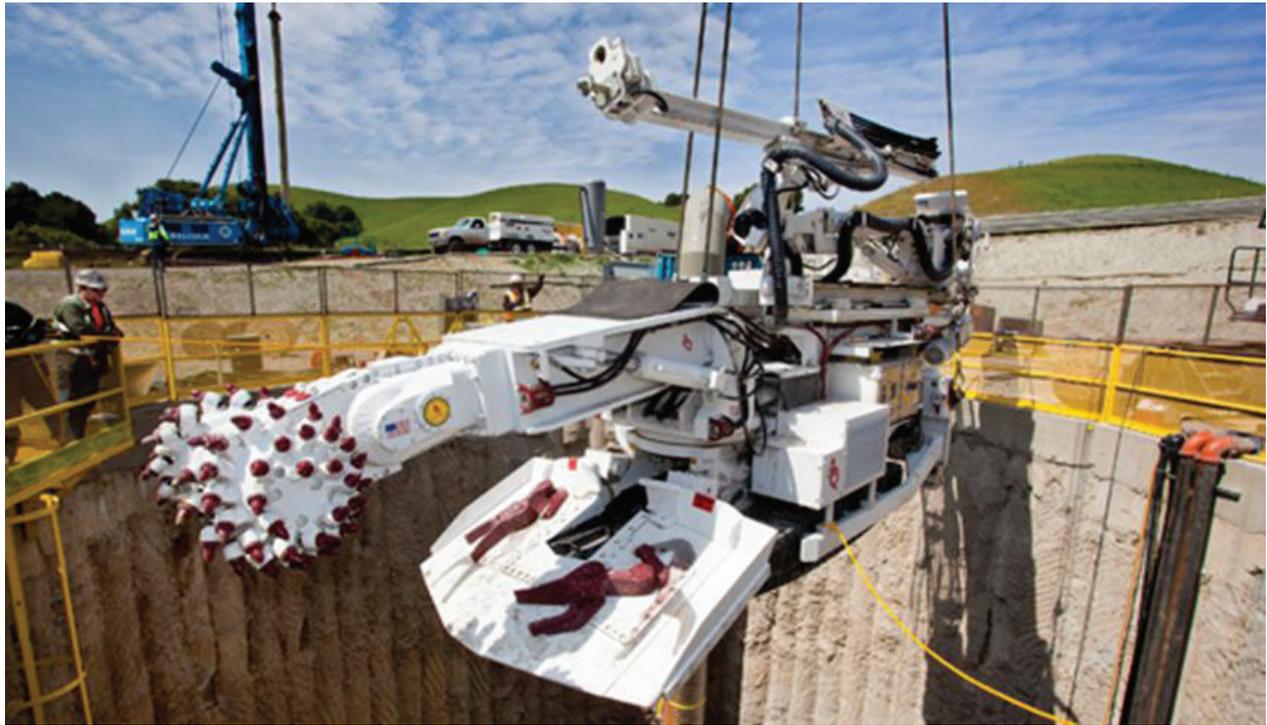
ROADHEADER FROM NEW IRVINGTON TUNNEL PROJECT
